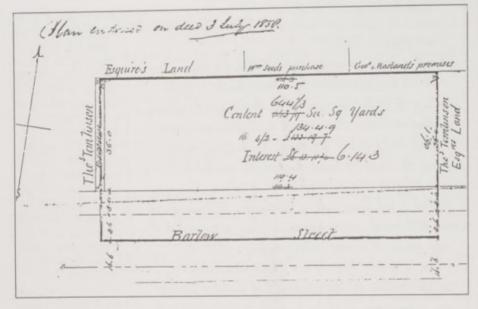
Building plot for ten houses on Barlow Street, 1858.
